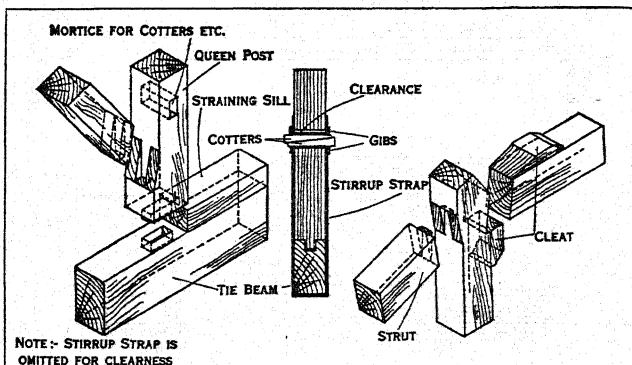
(A) DETAIL OF QUEEN-POST TRUSS AT B. (B) VERTICAL SECTION THROUGH QUEEN-POST. (C) DETAIL OF QUEEN-POST TRUSS AT HEAD; PURLIN AND WROUGHT-IRON STRAPS ARE OMITTED FOR THE SAKE OF CLEARNESS
